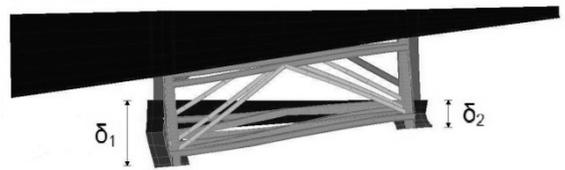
Deformed deck shape due to an asymmetric train load – alternative B
